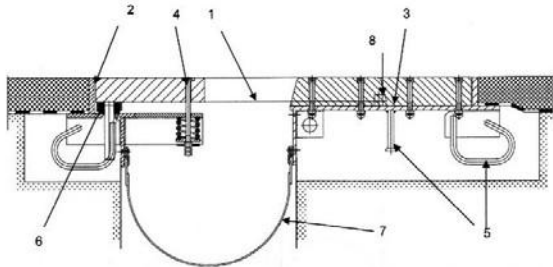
Supported Expansion Joint acc. to ETAG 032-7: 1 – sliding plate, 2 – fixe support base, 3 – sliding support base, 4 – holding down device of sliding plate, 5 – anchorage system, 6 – support, 7 – gutter, 8 – sliding support.
